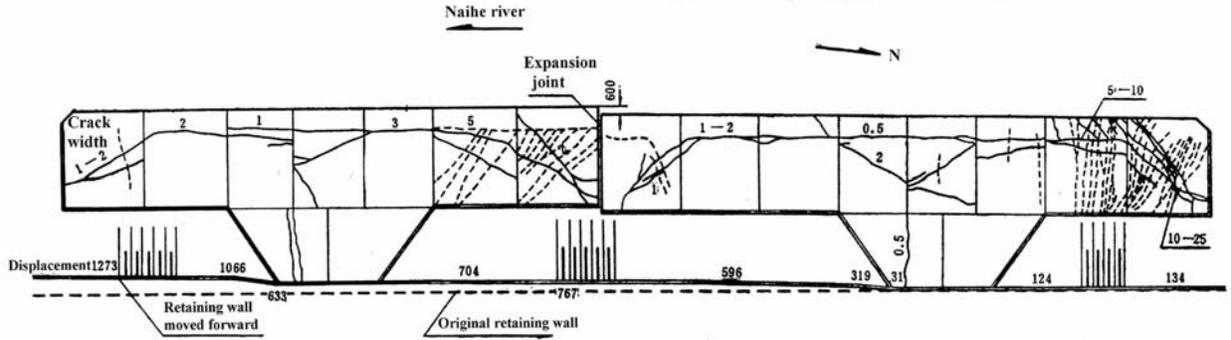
State of pier displacements and cracks of pier decking at the FIS pier (in mm).
